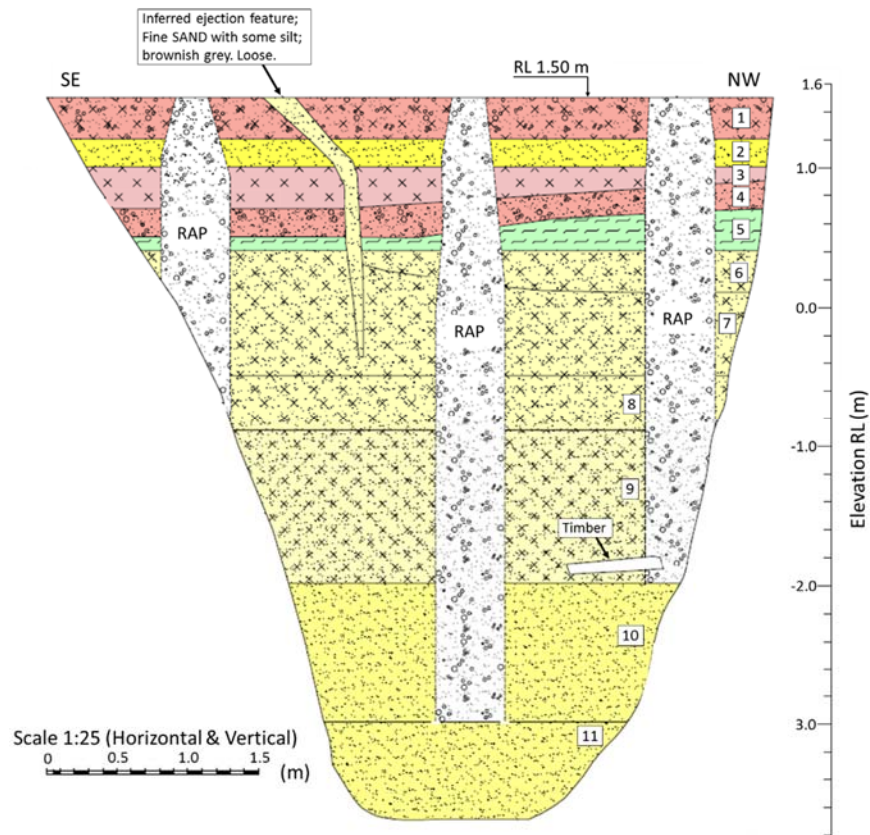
Cross-section of excavation trench at the 4-RAP-1 Test Panel. Modified from van Ballegooy et al. 2017.
